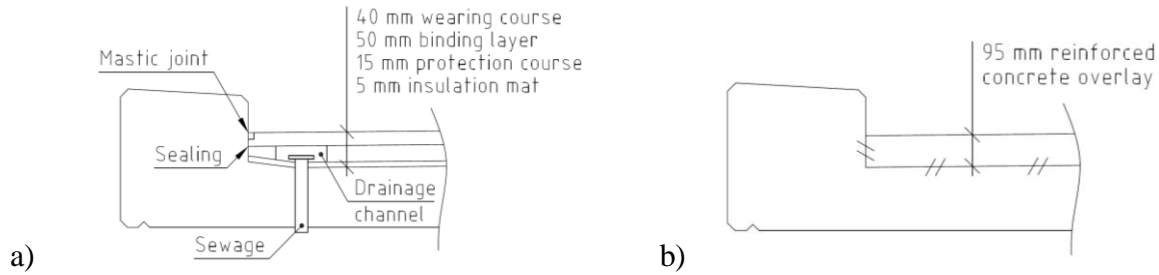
Typical and common solutions for protection of structural bridge decks by insulation mat, etc. (a) and directly cast concrete overlay (b).
